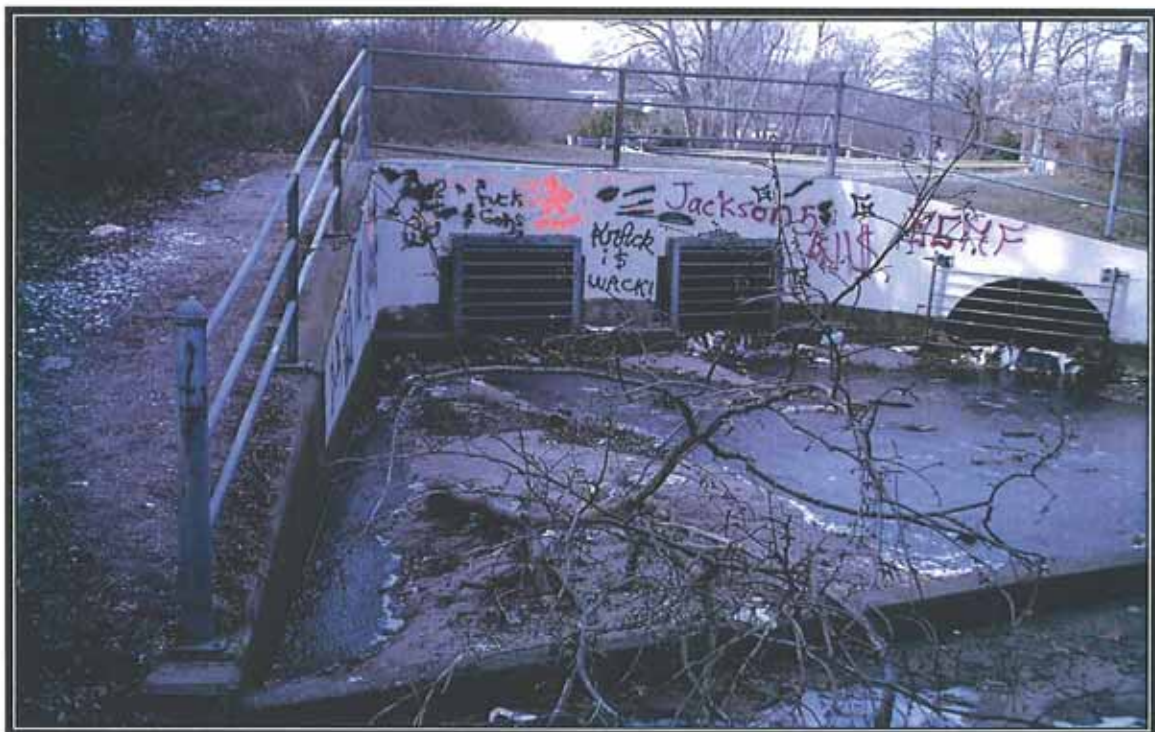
Typical view of existing trail system north of proposed drainage channel crossing (January 2007).
